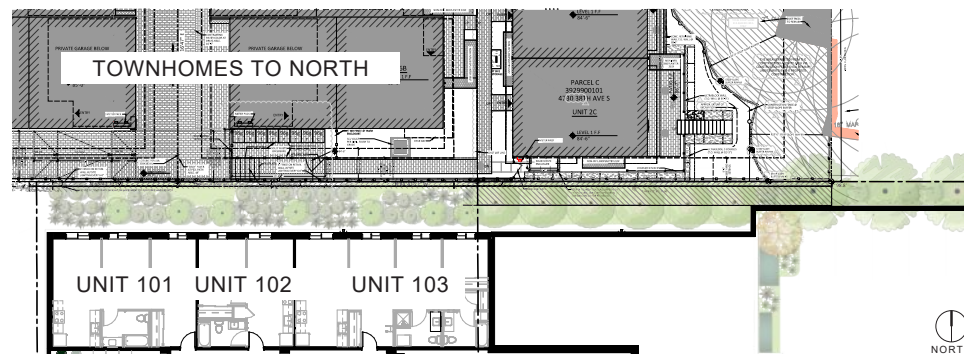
Plan showing condition at north property line, including landscaping and neighboring buildings' relationship with the proposed.
